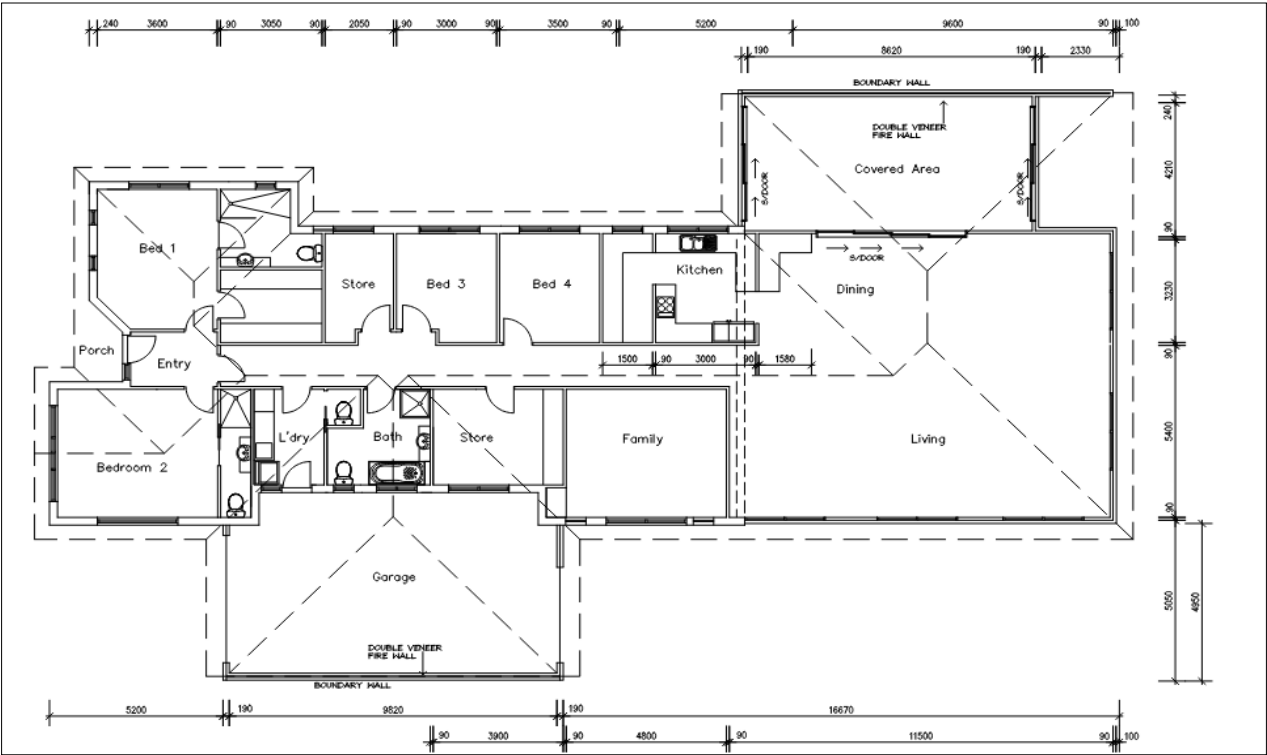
Floor plan (Steven Penton Building Design, 2022)
